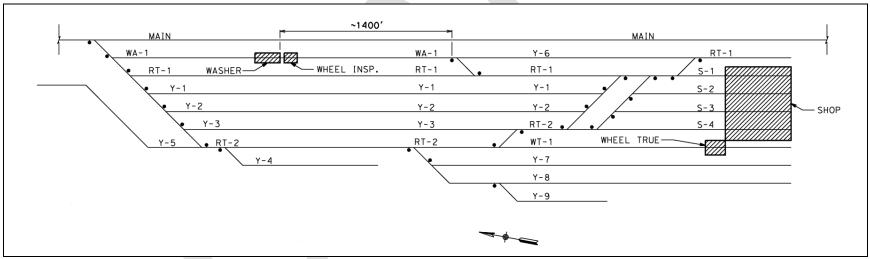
Los Angeles 8th Street Option – Track Layout
